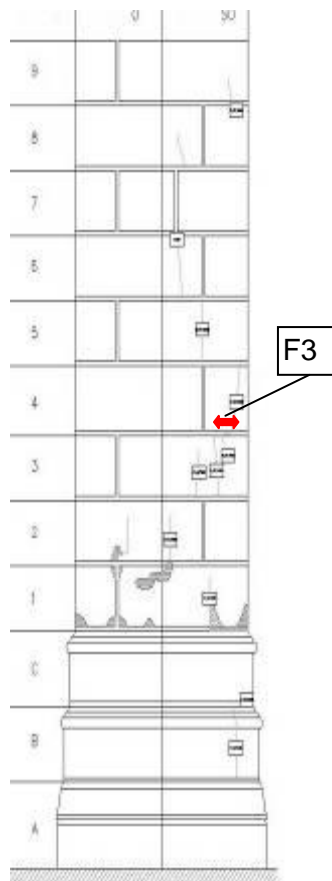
Monitoring of crack in pier 4N (Roca, 2004)
